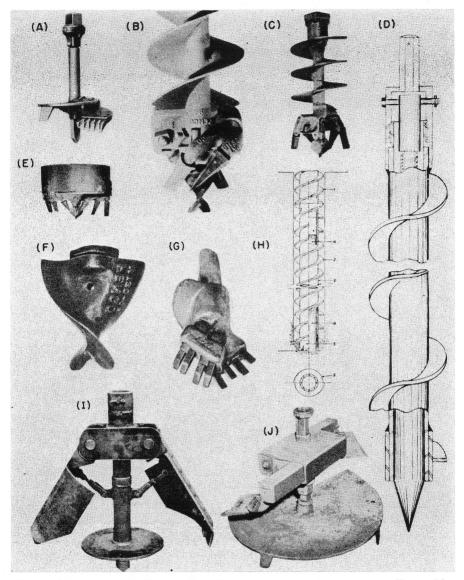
Soil sampling and drilling tools for power augers. For taking shallow bites, and retaining a sample on the auger, single flight bits (A), (E) and the lower half of (J) could be used. For fast drilling, bits (B) (C) and (G) could be used, but materials will be mixed and layer thicknesses will have to be measured in the side-wall of the augered hole.
